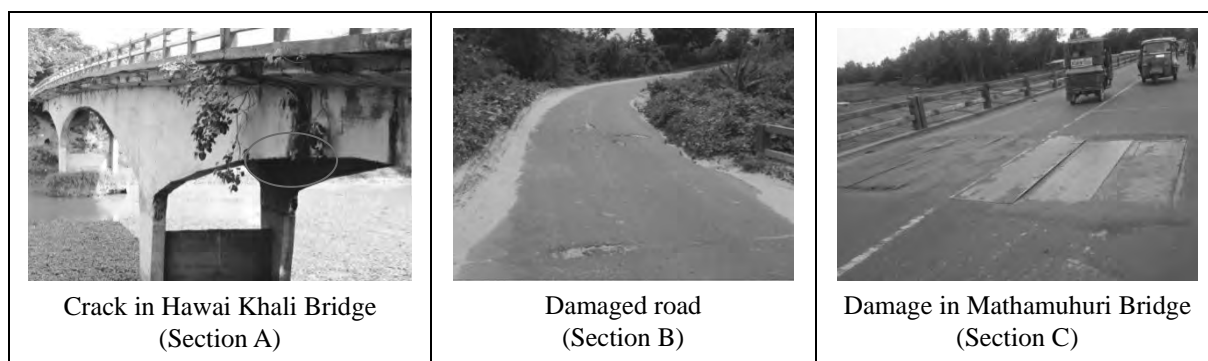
Photographs of Damaged Bridges and Roads
